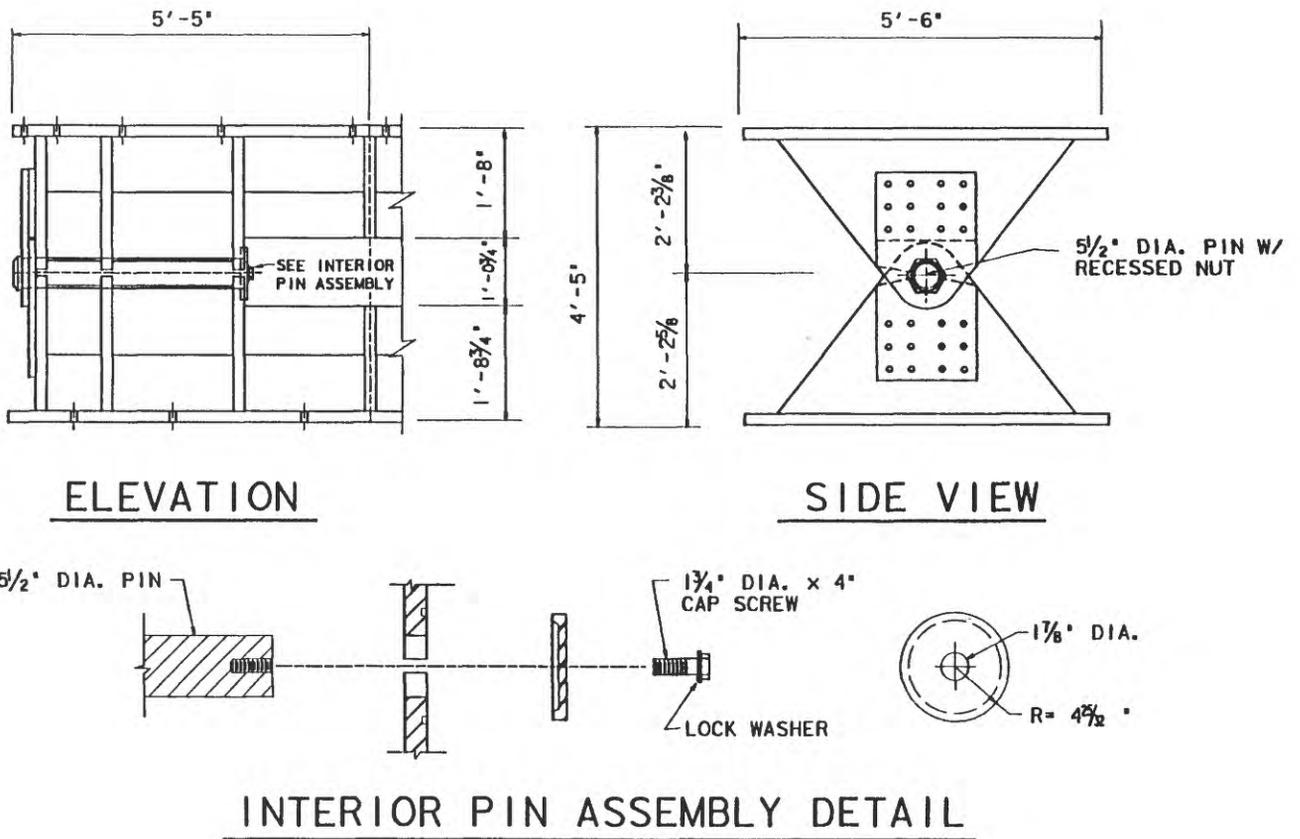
Details of steel pin support used as bearings at Piers 18 to 21 of San Mateo-Hayward Bridge (courtesy of Earthquake Engineering Research Institute).
